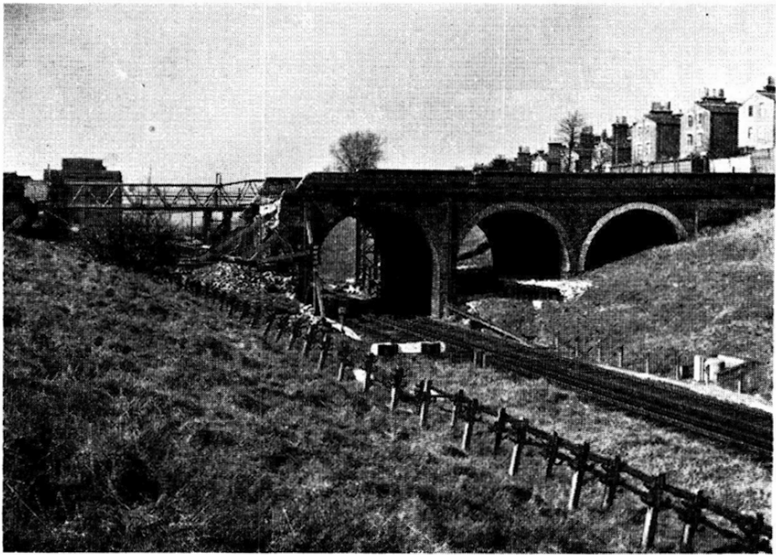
ASPINAL ROAD BRIDGE—PILING AND STRUTTING, TEMPORARY FOOTBRIDGE IN BACKGROUND
